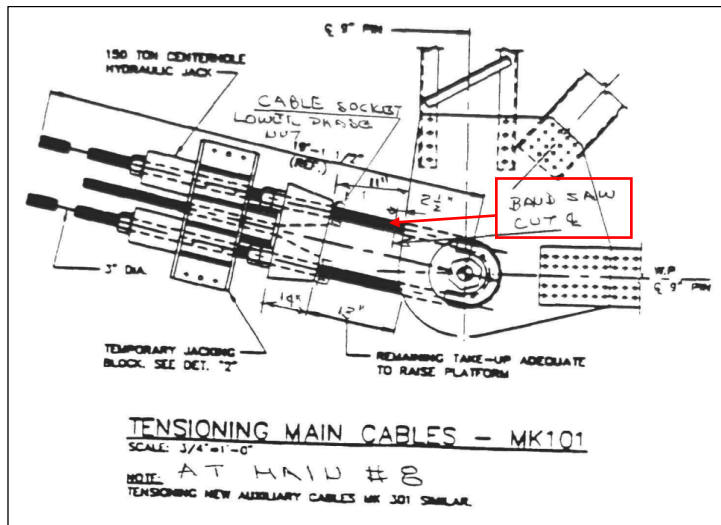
Location of threaded rod damage on M8-4 connection to platform (image: NAIC Arecibo Observatory, a facility of the NSF).
